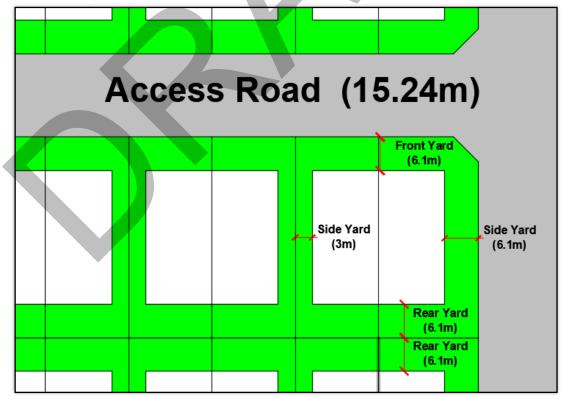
Minimum Setback for Detached Dwelling Units.
